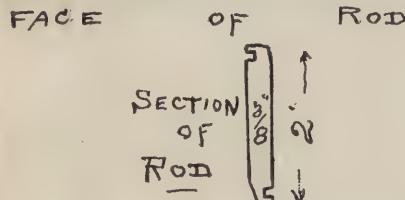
HARDWOOD ROD FOR MAKING “RODDED JOINTS.”
